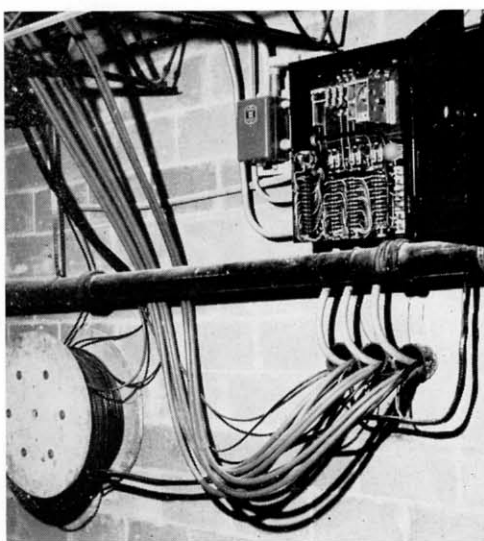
(above). View of conduit entrance to building, junction box with tower light flasher, photo-electric motor starter, and (at left) reel of surplus sampling line from #2 and #3 towers.
